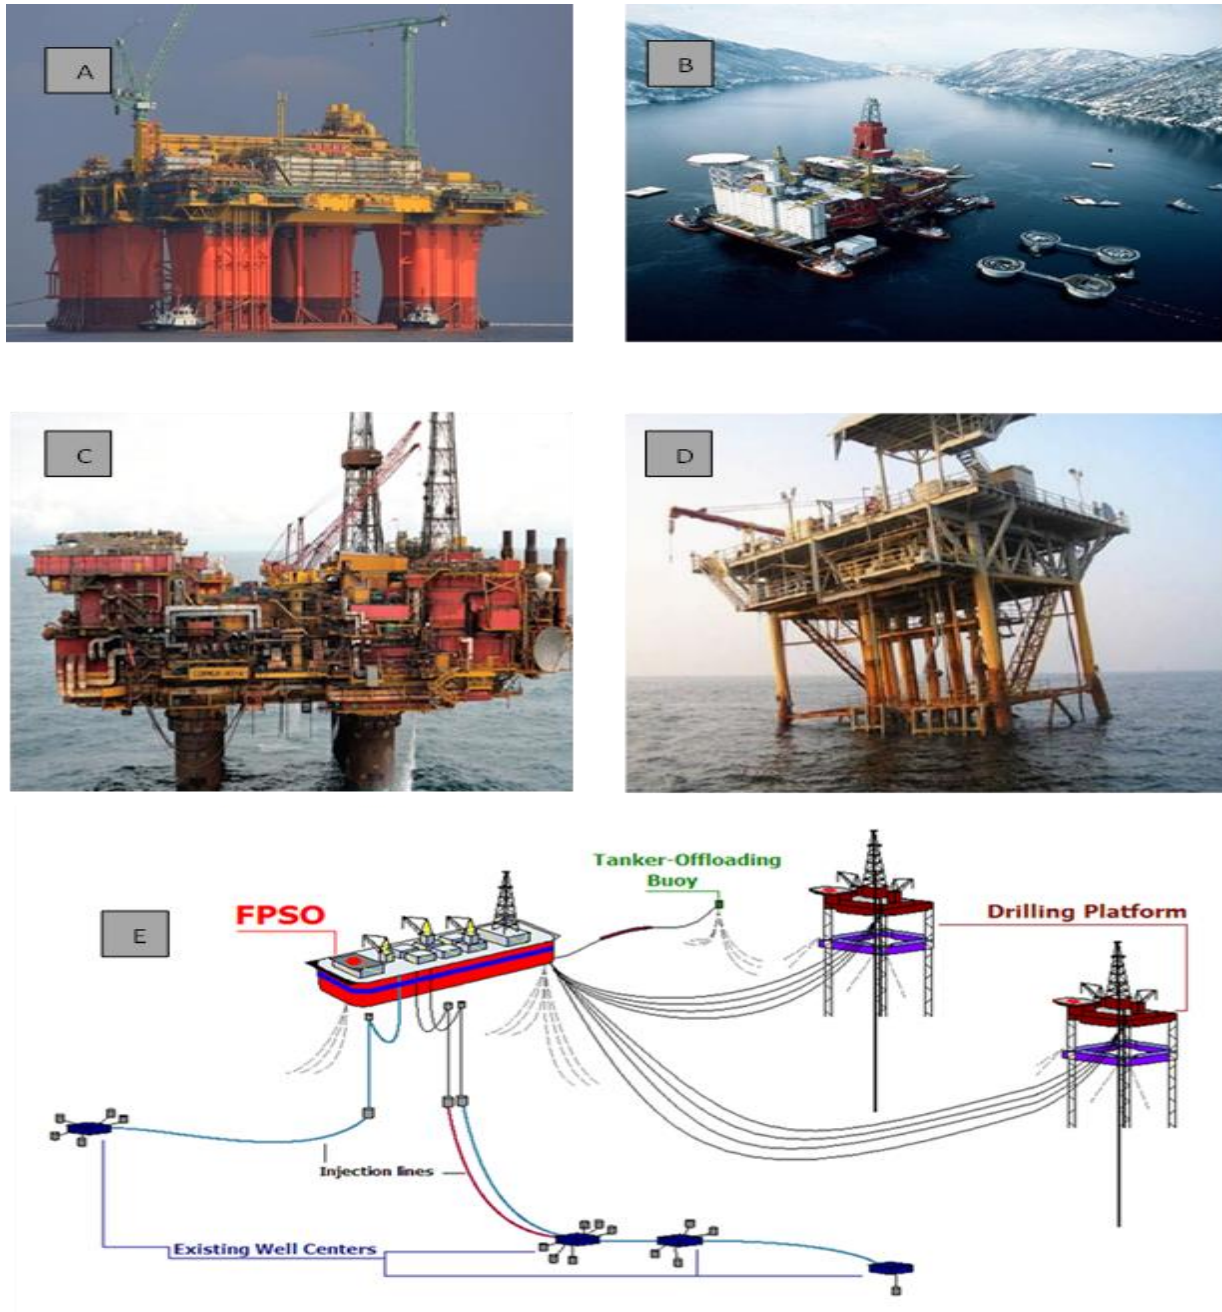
Offshore Structures. (A) Floating Production System; (B) Concrete Gravity Platform; (C) Complaint Tower; (D) Fixed Steel Template Structure; (E) Process of Floating, Production, Storage and Offloading (Dewangan et al., 2010).
